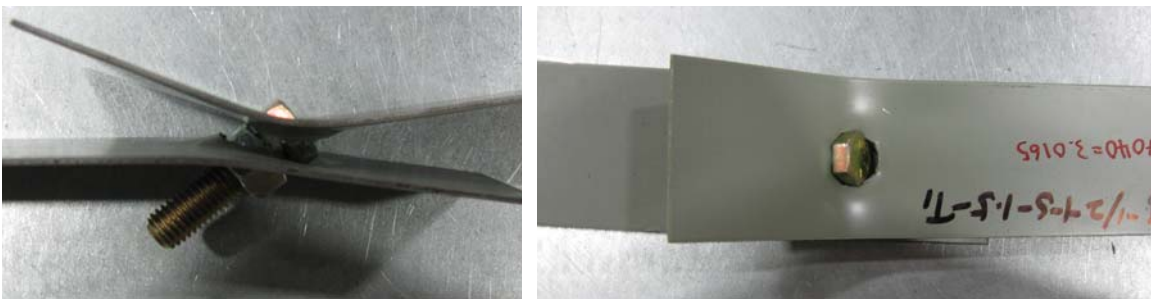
Failure Mode of Test Specimen 73O-73SST-1/2-1-S-0.2-T1
